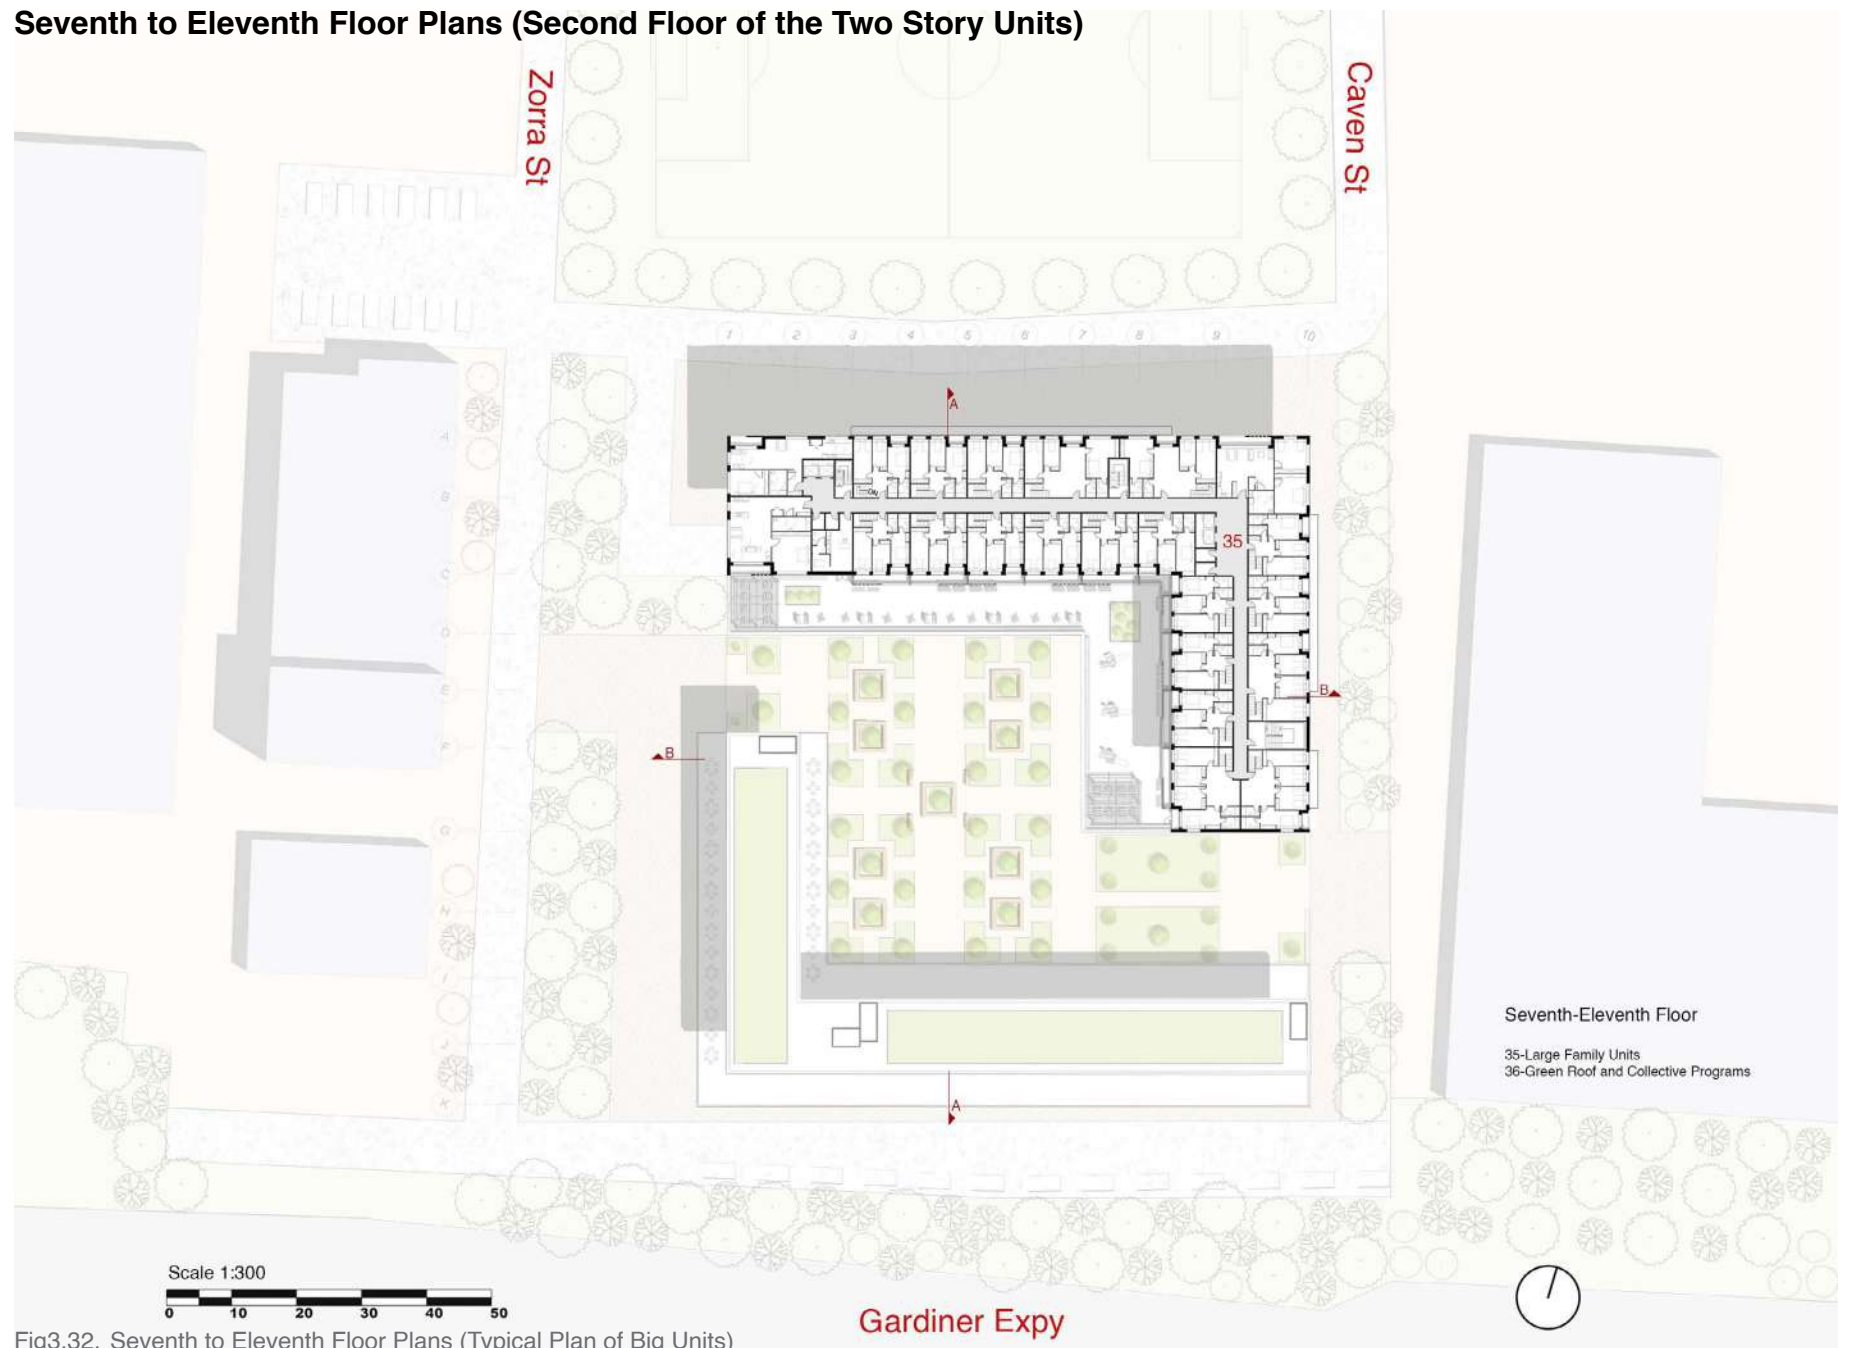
Seventh to Eleventh Floor Plans (Typical Plan of Big Units)
